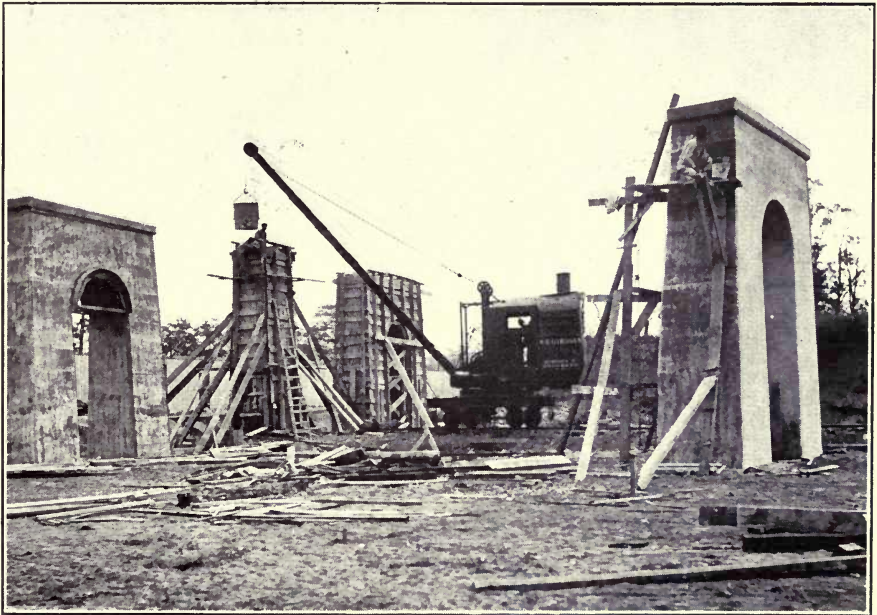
FILLING PIER FORMS, FIRST AVENUE VIADUCT.
